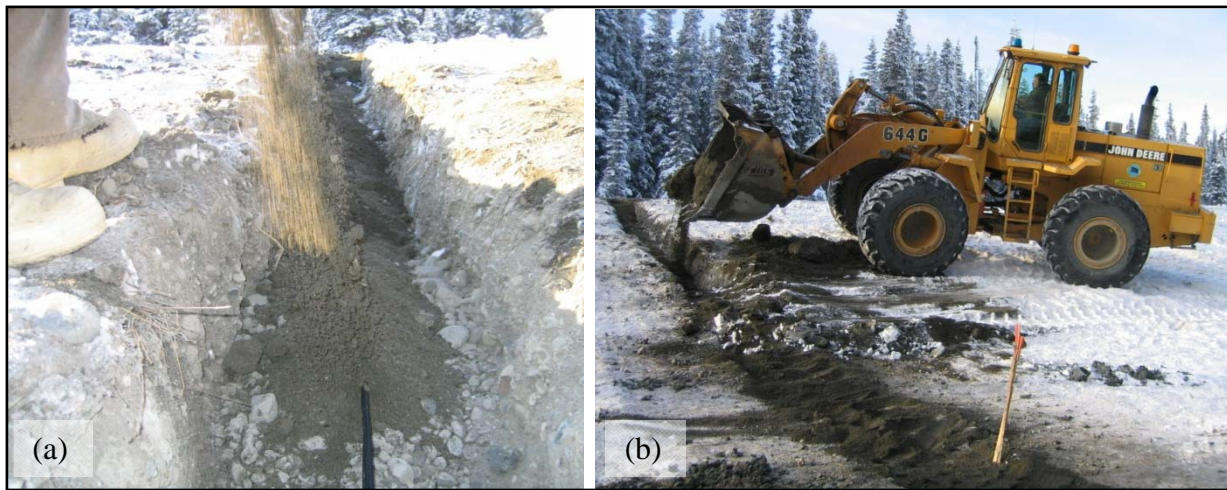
Backfilling the trench: (a) anchoring the cables using buckets and shovelfuls of sand; (b) M&O making short work of the backfilling with a loader.
